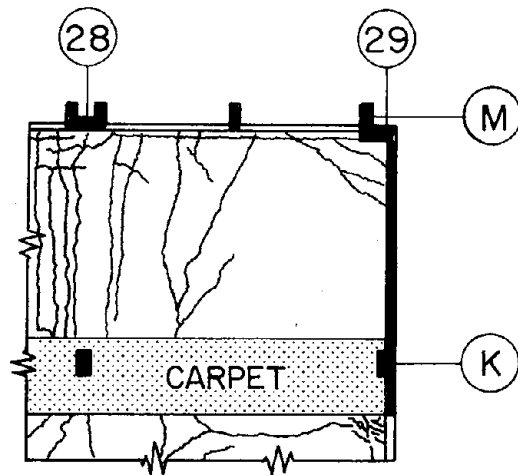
CRACKING PATTERN OBSERVED AT TOP SURFACE OF FOURTH FLOOR SLAB, WING D
